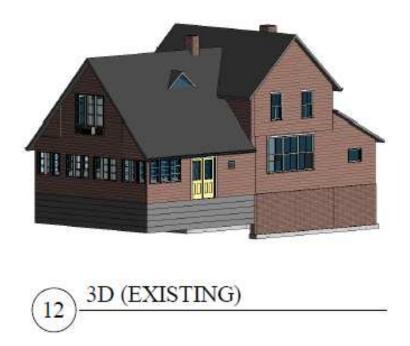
Sketch of *Existing Structure, front and east elevations, 869 Sangster Avenue.* (*Image from owners.*)
